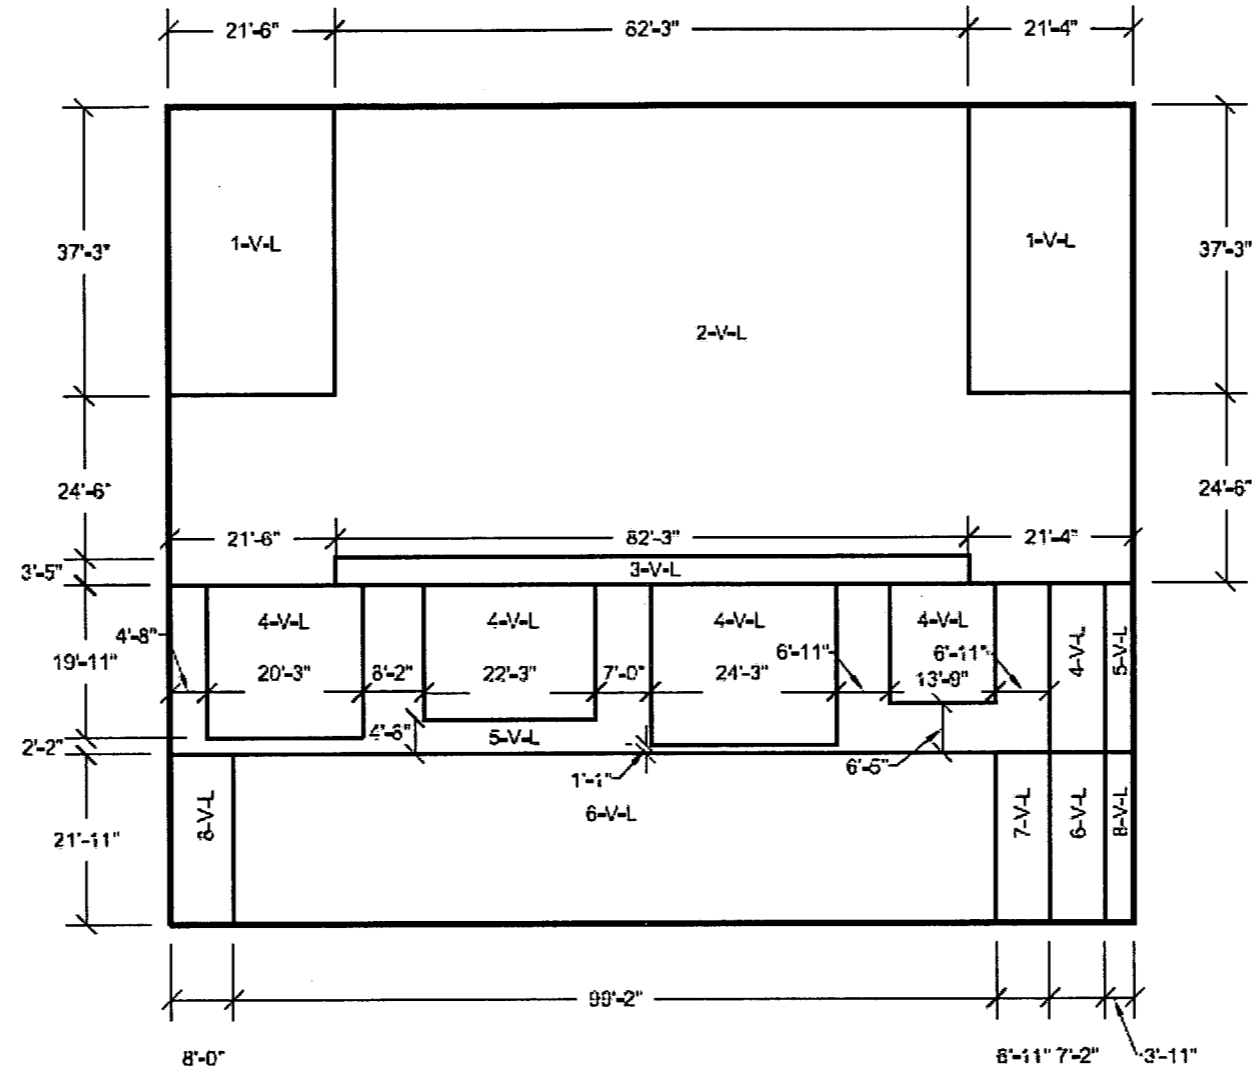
H.3-24: WEST WALL LOOKING EAST
